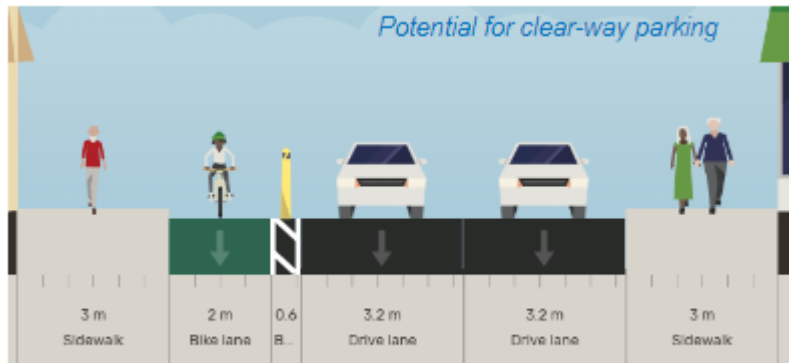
NS-2UA/3UB/3BA Cross section D (looking south)
